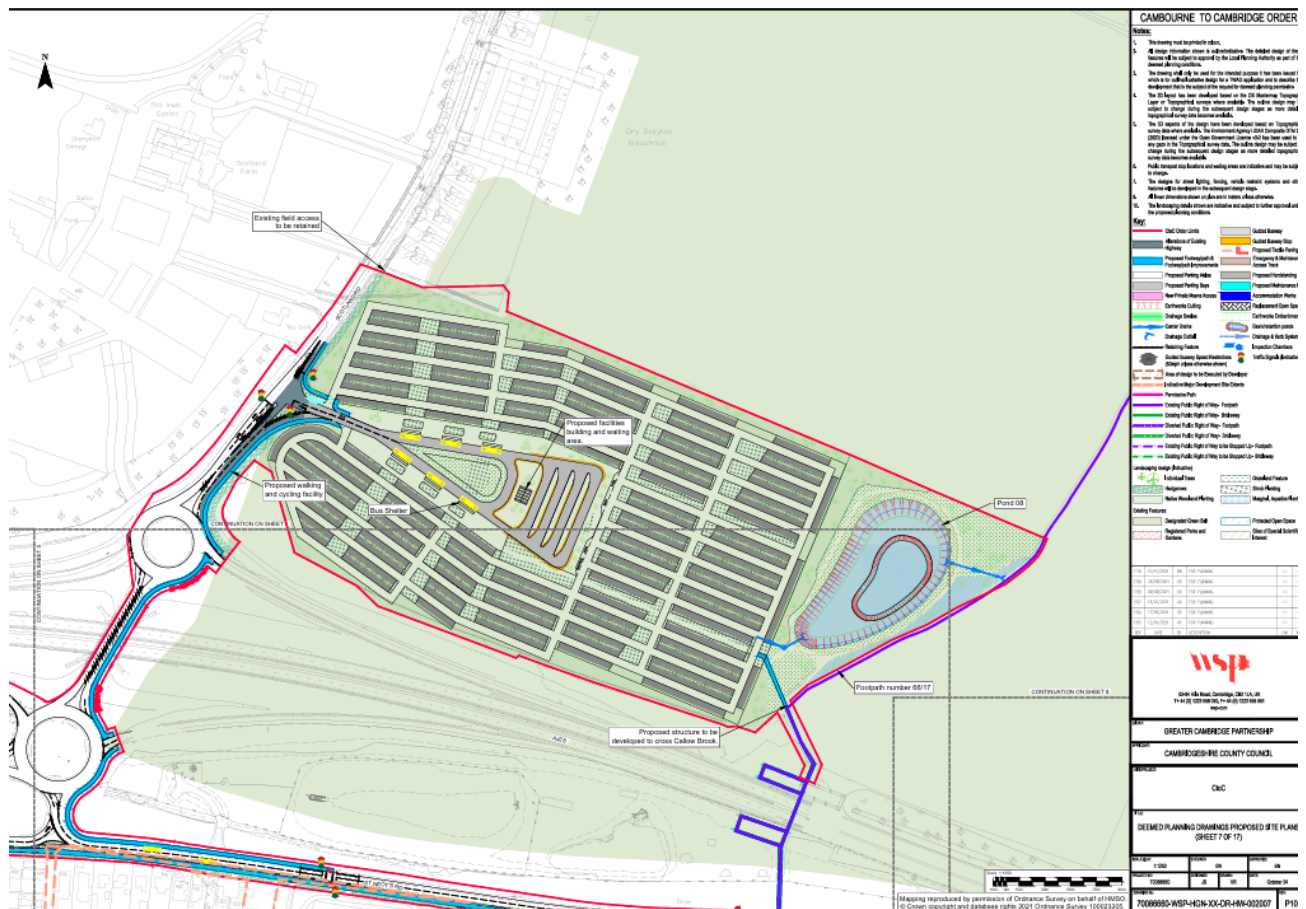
Proposed Site Plan of Scotland Farm (reference: 70086660-WSP-HGN-XX-DR-HW-002 Rev P10 – Cambourne to Cambridge Busway Application Submission)
